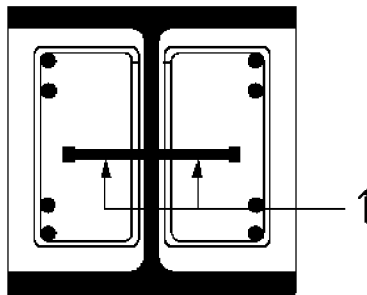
Composite beam comprising steel beam with partial concrete encasement
